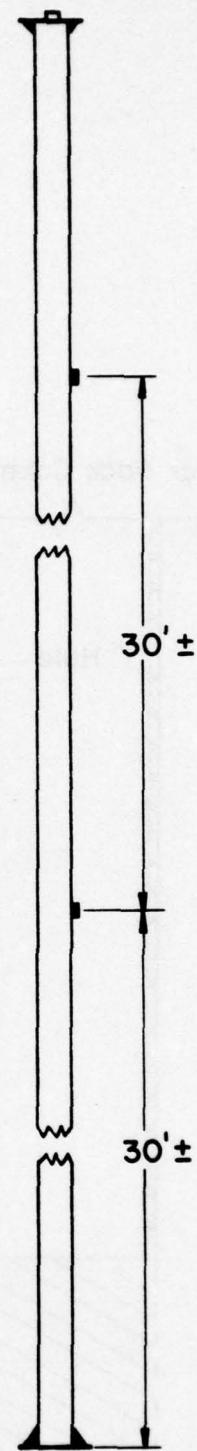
Fabrication of Outside Tubular Rack Columns to be used as Water Conductors.
